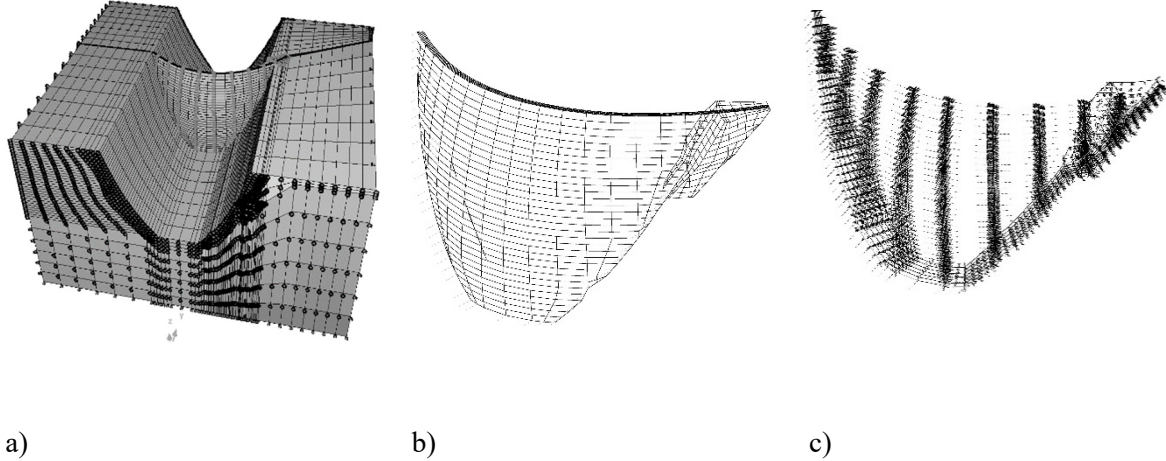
St. Petka dam model. A) Spatial view from stream side, b) Discretization of the dam body and the concrete block, c) Interface elements at contact dam-foundation and in at contact concrete-grout mix in dam joints
